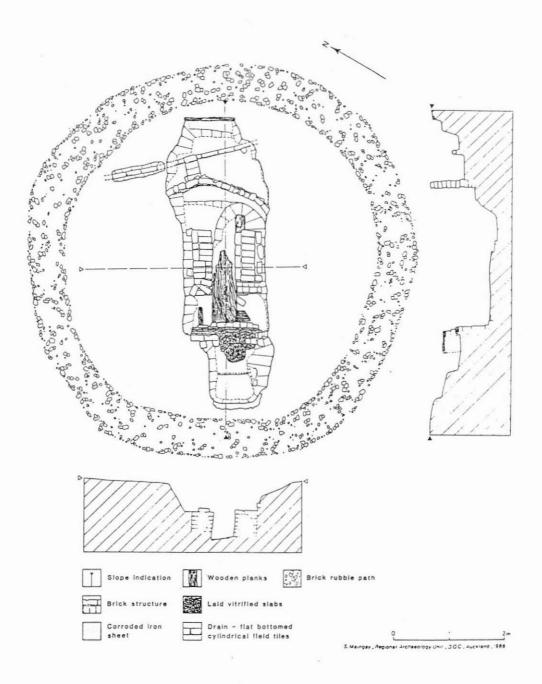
Plan and profiles of pug mill (A4), Pollen Site.
